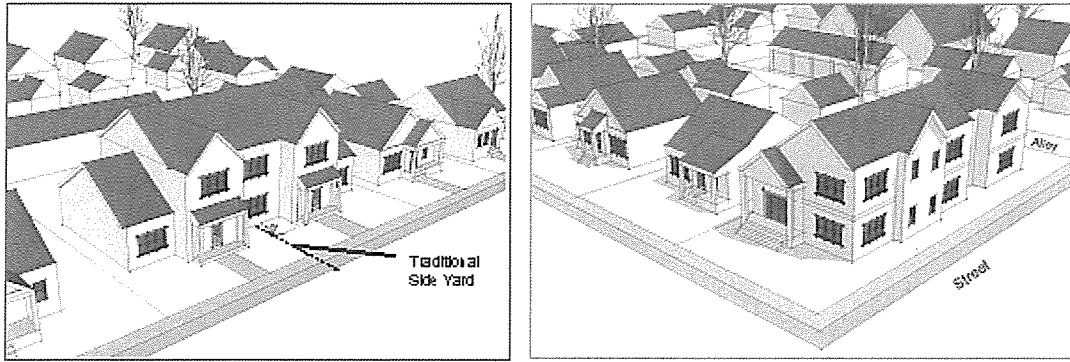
Wells Avenue Neighborhood Plan General Residential Architectural Character
